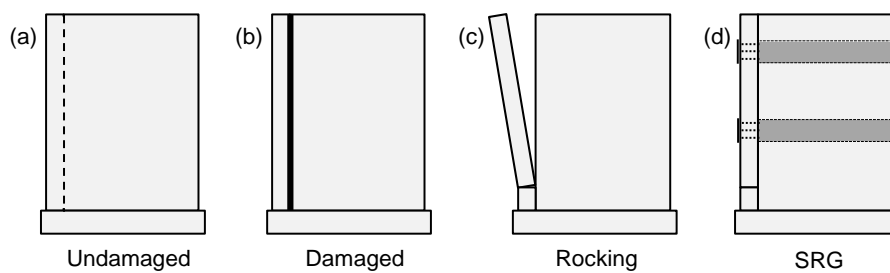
Specimen configurations: undamaged (a), damaged (cracked without front wall separation, b), rocking (detached façade, c), and retrofitted with SRG (d).
